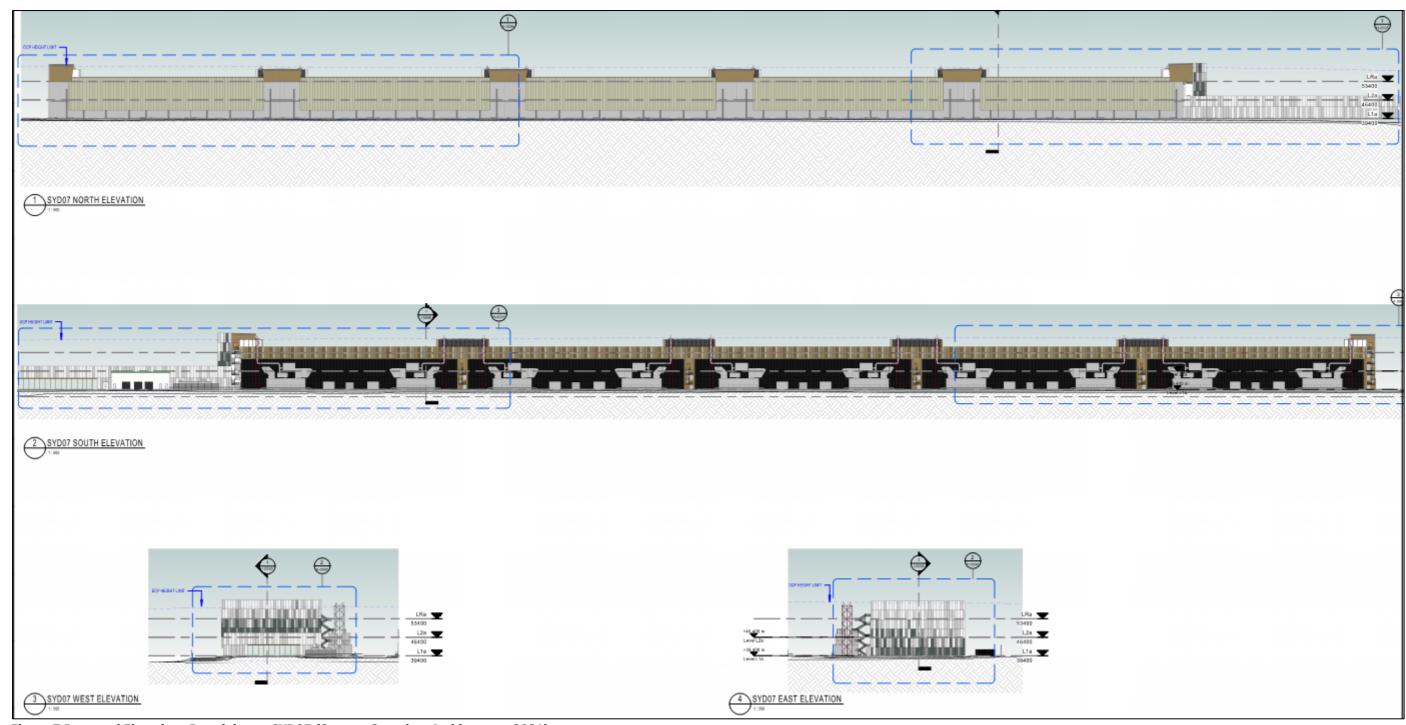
Proposed Elevations Pertaining to SYD07 (Source: Greenbox Architecture, 2021)
